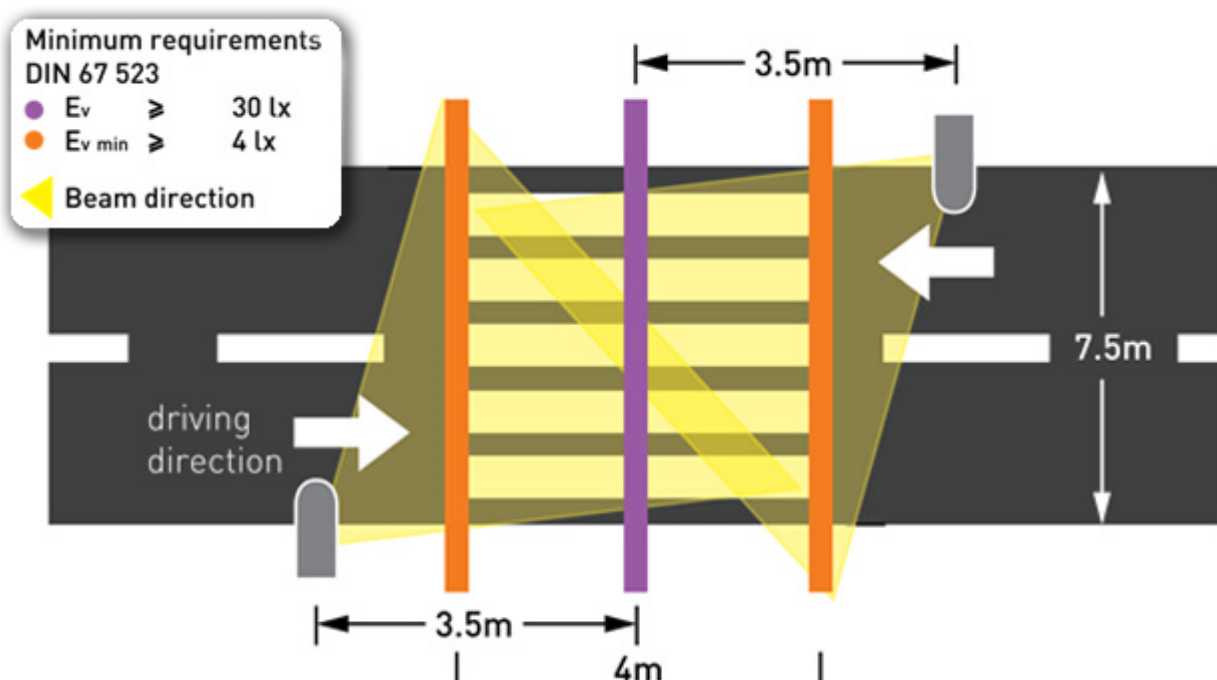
Pedestrian Crossing: lighting requirements [https://www.ledil.com/application_example-2/pedestrian-crossings-with-strada-2x2-px-and-pxl/]
